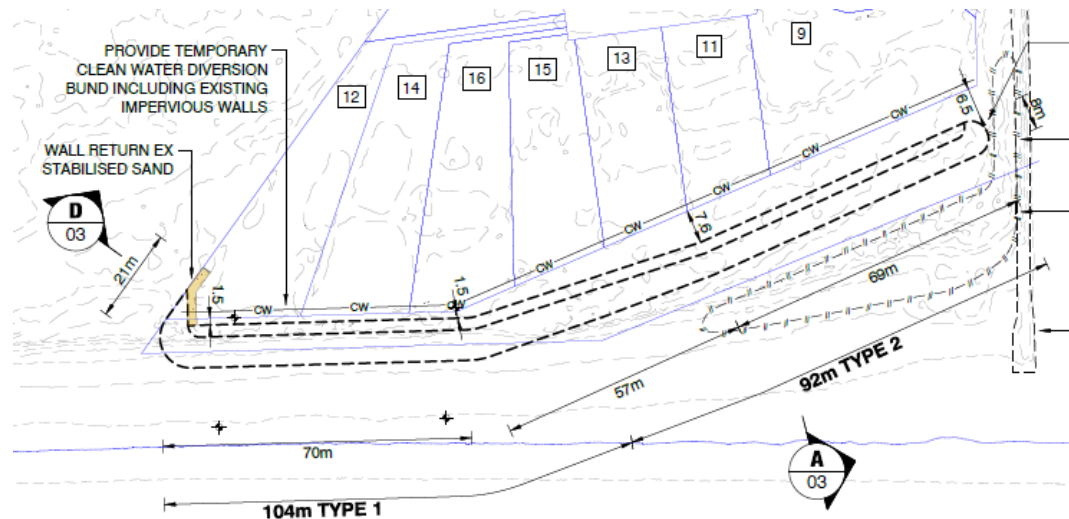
Amended Layout Southern Wall 1.5m from Boundary
